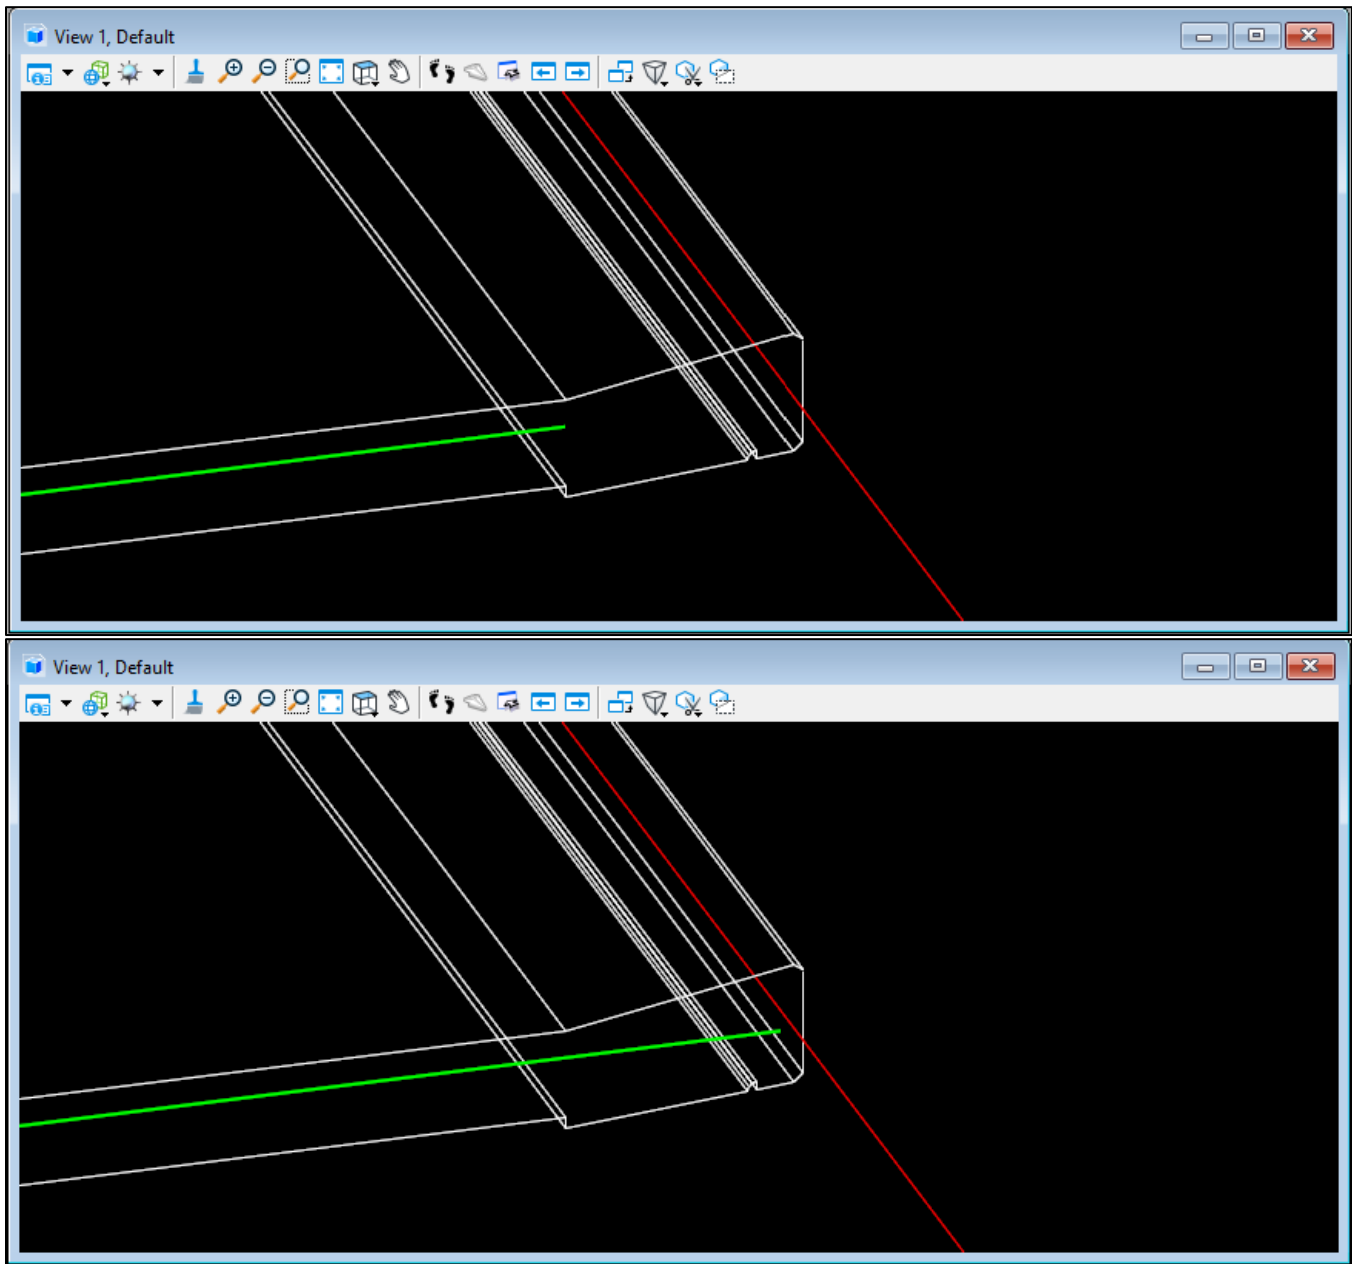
Before/After Extending the Shape Guideline to Side Cover Trim Line
